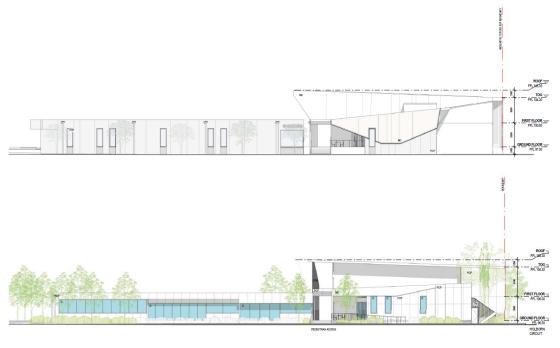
Digitaria Drive Elevation (Source: AN+A)
